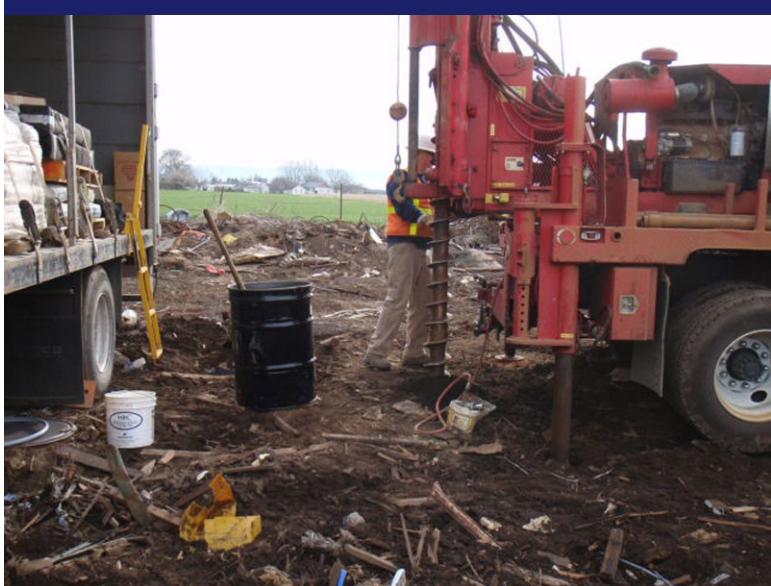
Drilling MW-4 with Cascade Drilling Company.
